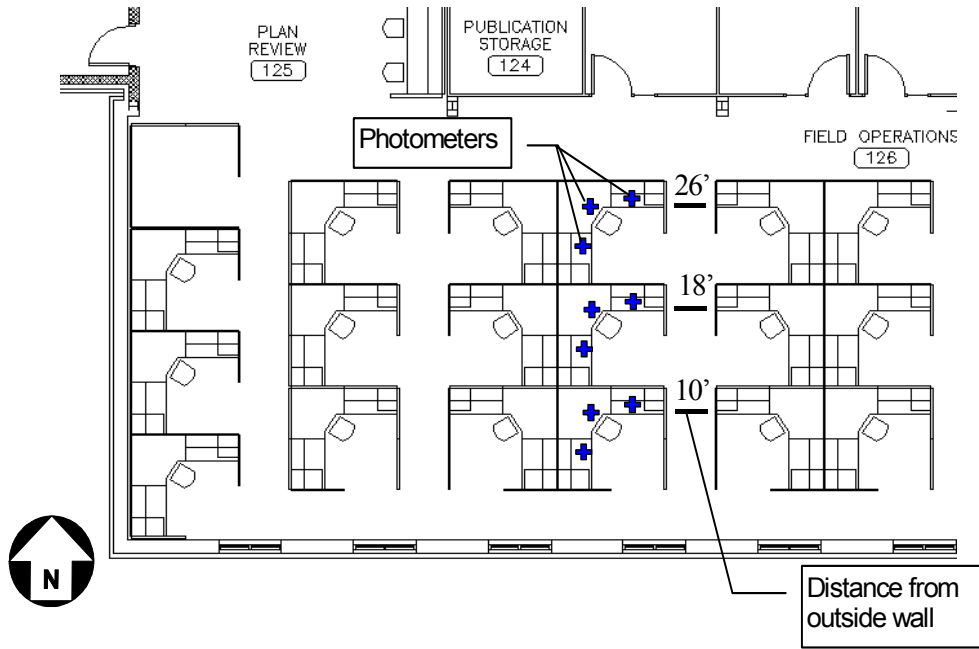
Photometer placement in the first-floor, southwest corner of the building
